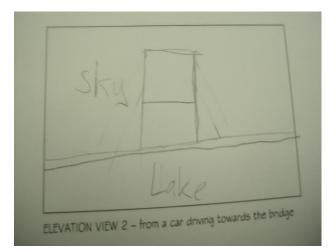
Plan view of bridge on worksheets. Figure 5. Elevation view of bridge.
